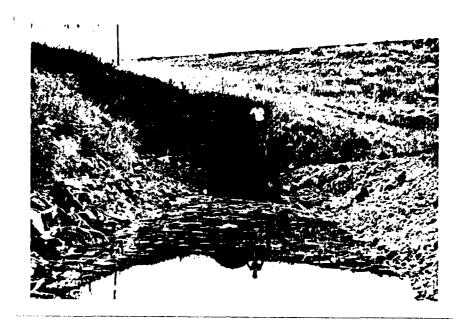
Picture of discharge end of 60-inch I.D. corrugated metal pipe used for service spillway.
